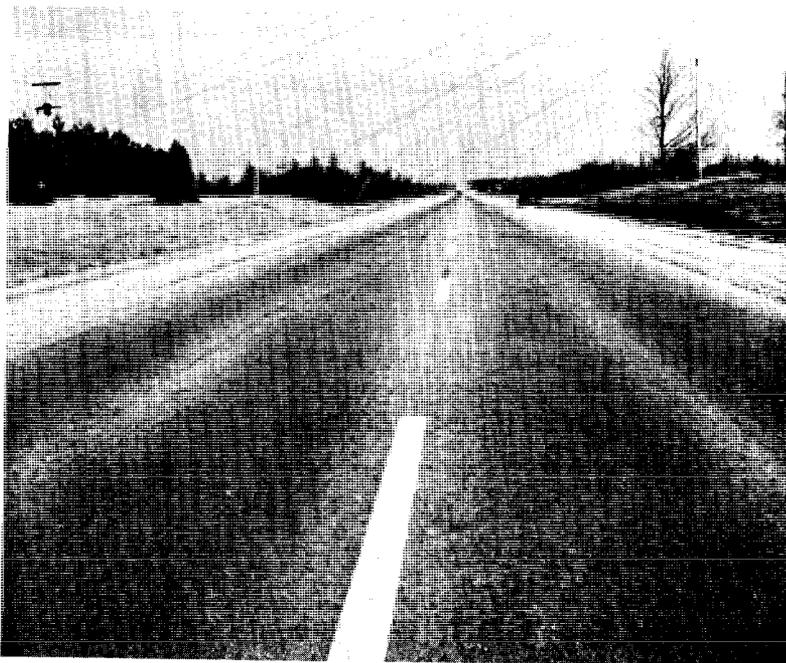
PAVEMENT MADE WITH 150/200 PENETRATION ASPHALT. LOCATED WEST OF ORANGEVILLE, ONTARIO. 4-YEARS OLD.
